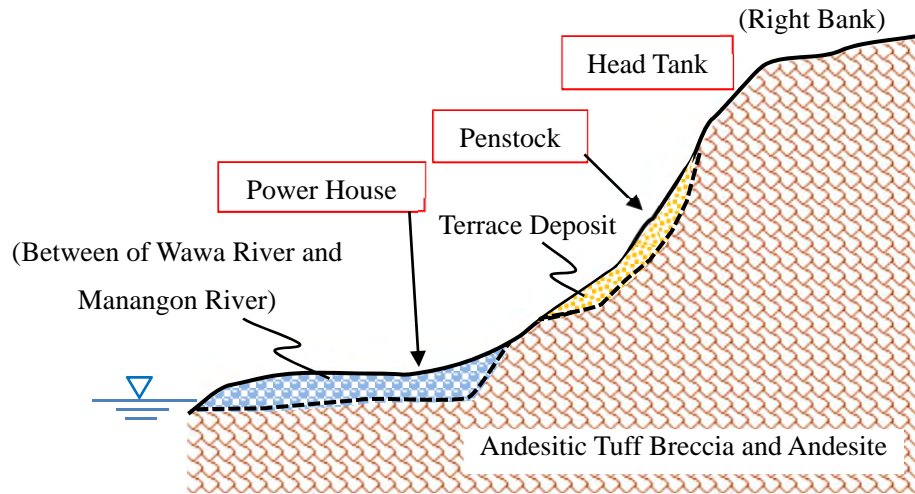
Schematic Geological Profile at Proposed Head Tank, Penstock and Power House Locations (View Toward Downstream)
